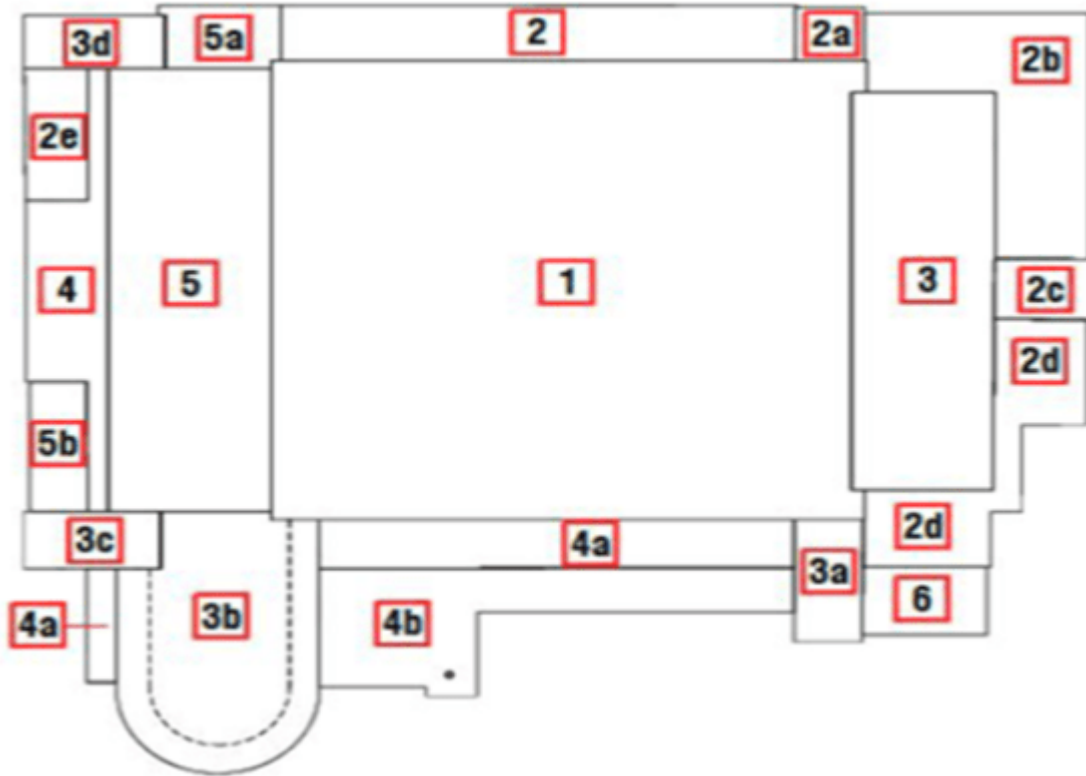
Drawing: extract from Architects Roof Plan detailing the complexity, different levels and number of flat roofs that make up the Main Pavilion roof surfaces.
